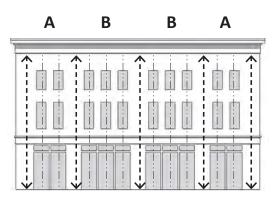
C.2: Structural and fenestration centerlines, showing how the solid and voids in the FAÇADE align vertically; and organization of the FAÇADE into vertical modules. The FAÇADE example here follows an ABBA pattern.
